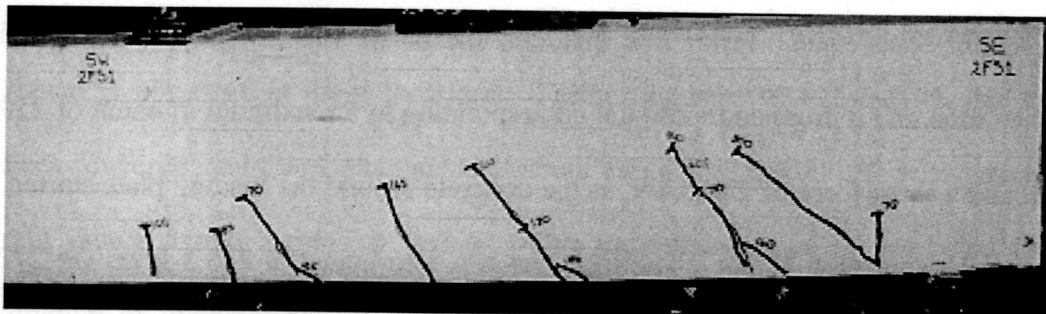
Beam-2F after carrying out repair for damaged concrete
